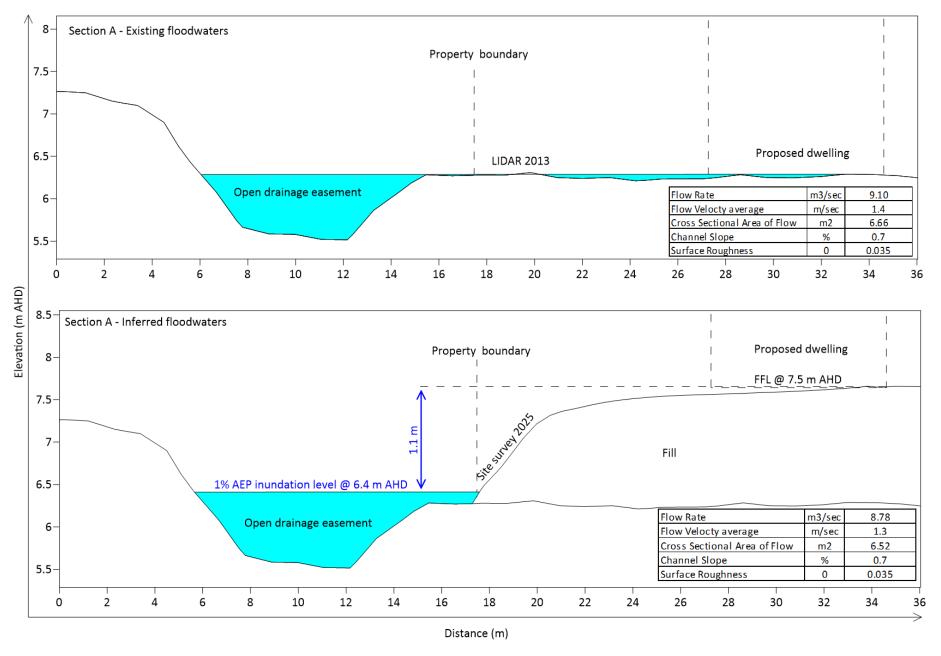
AEP Site Stormwater Flow Analysis – Cross Section C Within the Building Envelope - Drawings Are to Scale and For Conceptual Modelling Purposes Only
